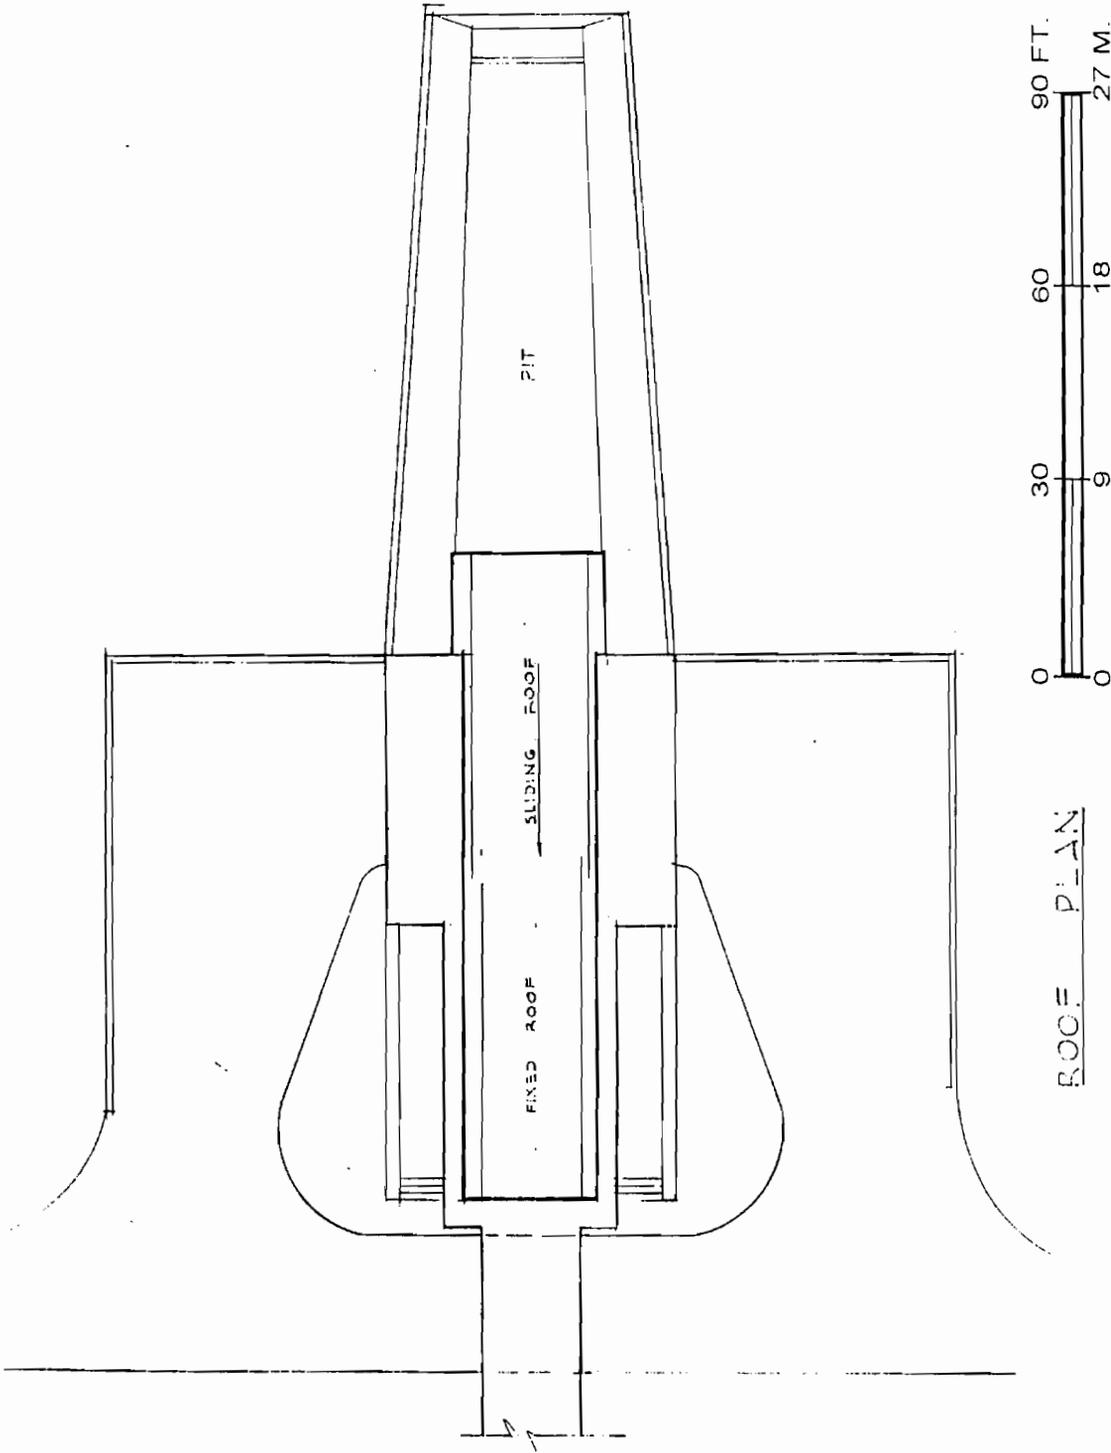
Building 3618, Test Area E-1, Blueprint # DP-142546, detail of first floor from Rocket Test Stand E-1, Roof Plans, Frank Grad & Sons, Architects and Engineers, Newark, NJ and Washington, DC. Picatinny Arsenal, Morris County, New Jersey (on file in DPW, Picatinny Arsenal).
